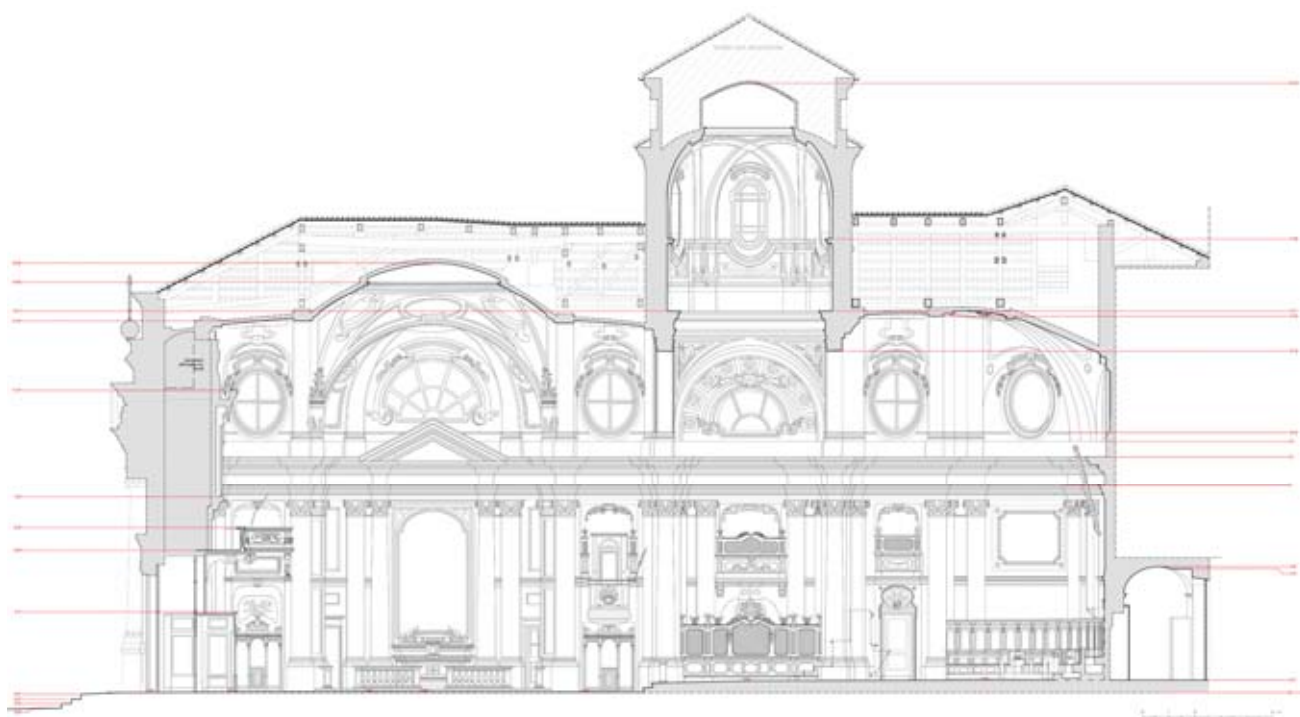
One of the final drawings: longitudinal section (original scale 1:50) of the hall of the Church.
